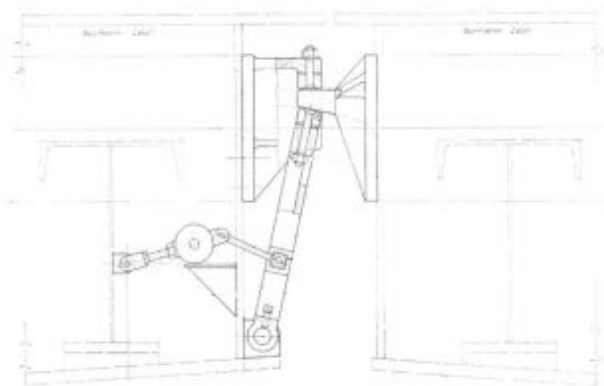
Swansea Bridge drawing of Brake Mechanism
